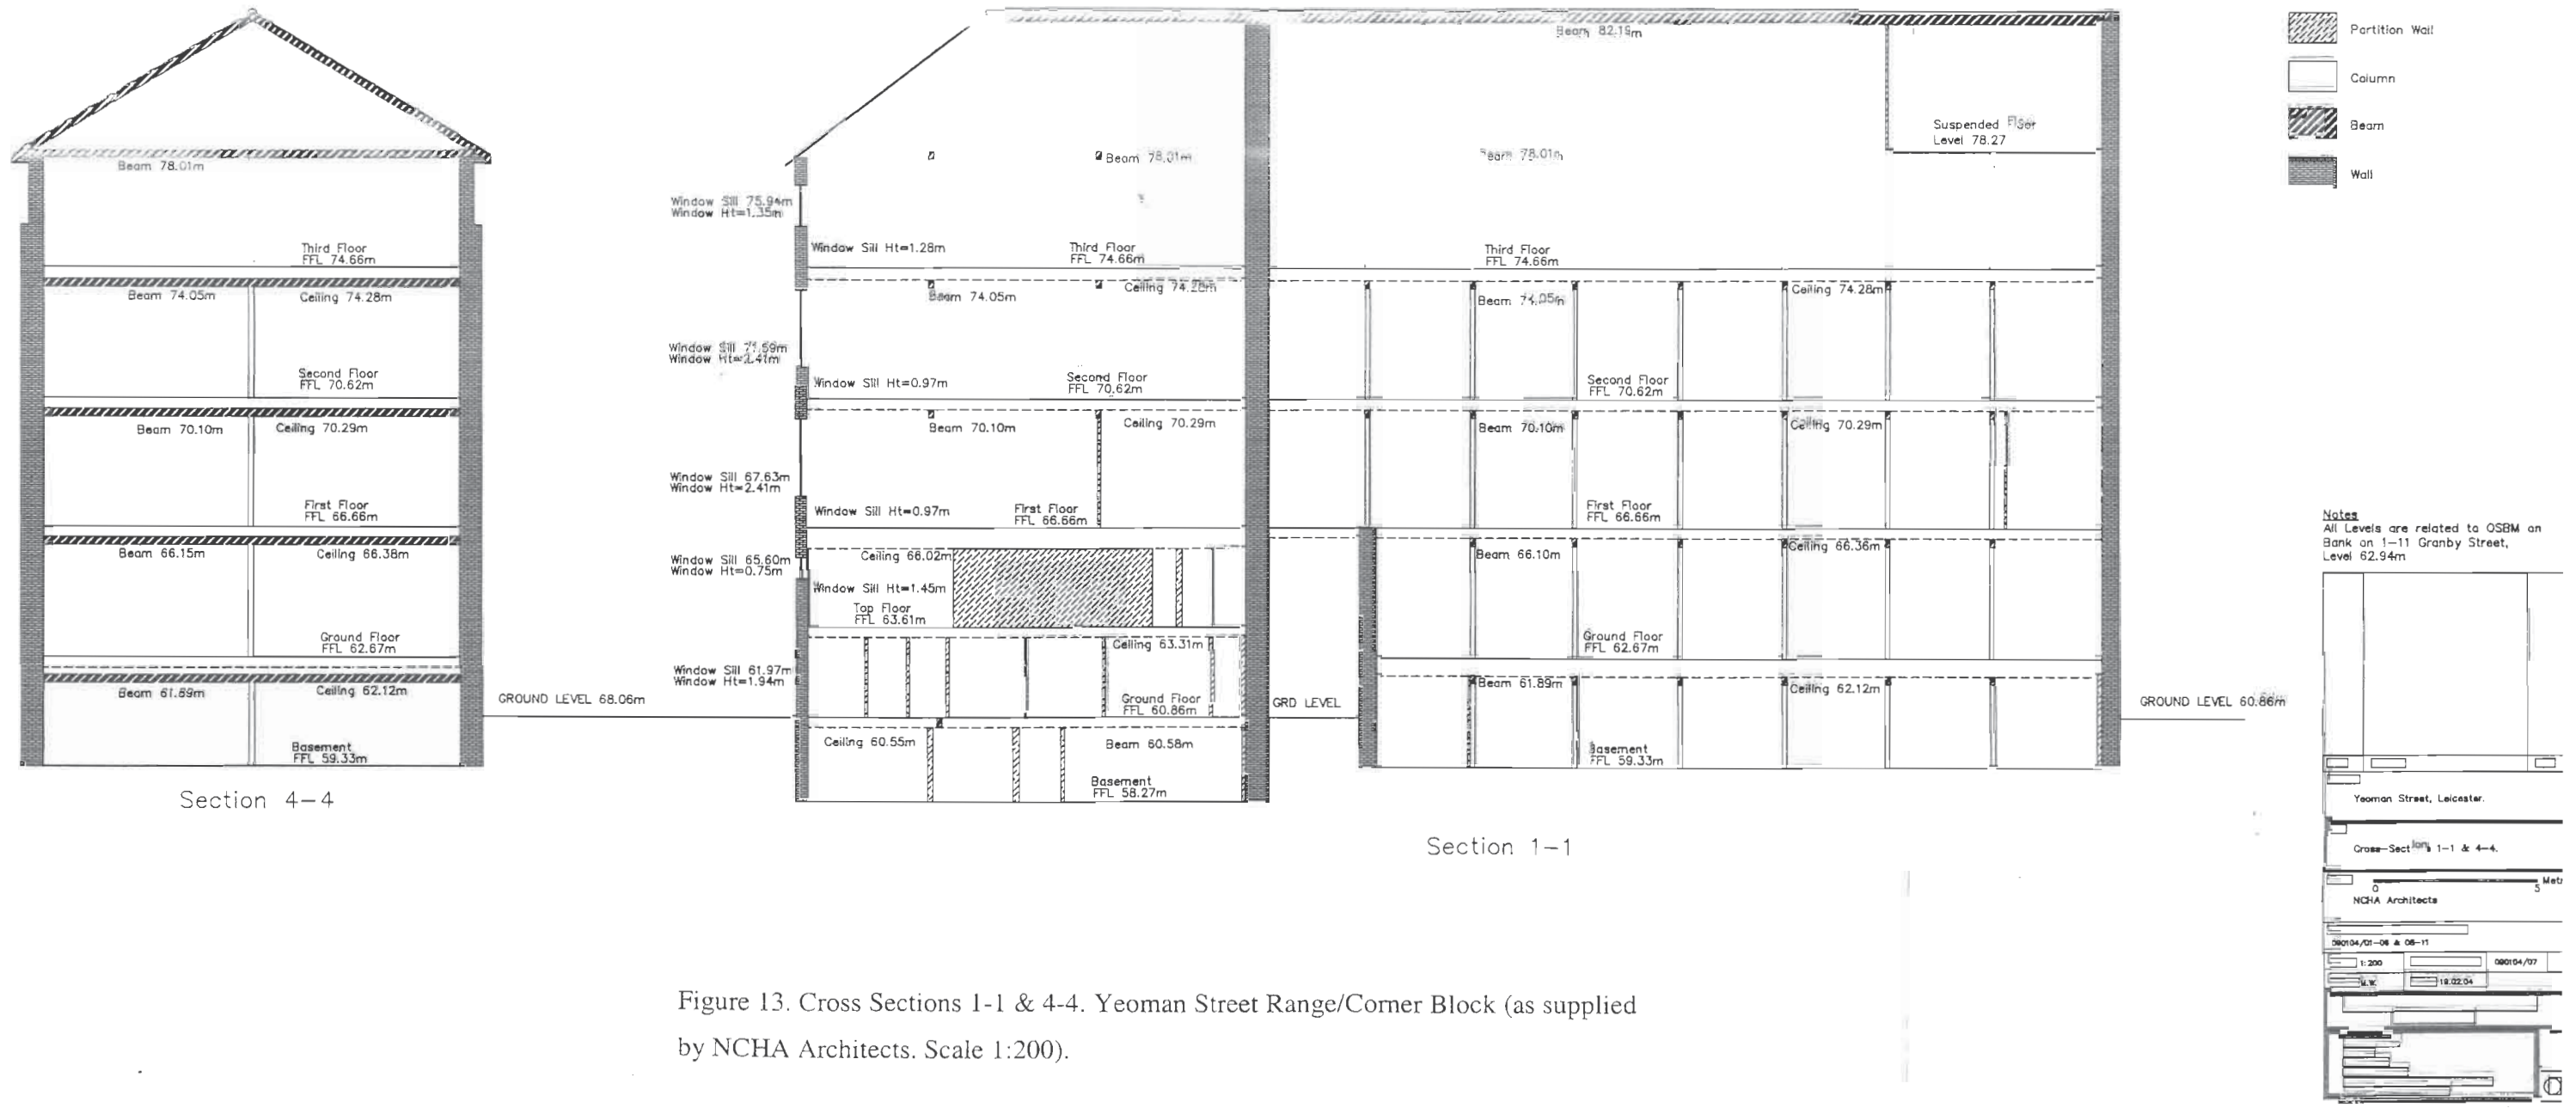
Cross Sections 1-1 & 4-4. Yeoman Street Range/Corner Block (as supplied by NCHA Architects. Scale 1:200).
